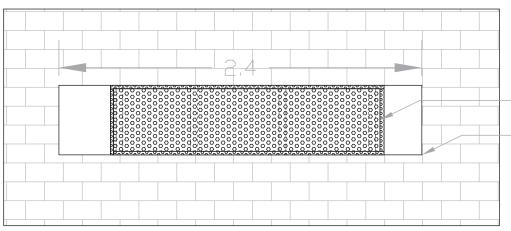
Bench without backrest. Section. Scale 1:25 (Author, 2008)
